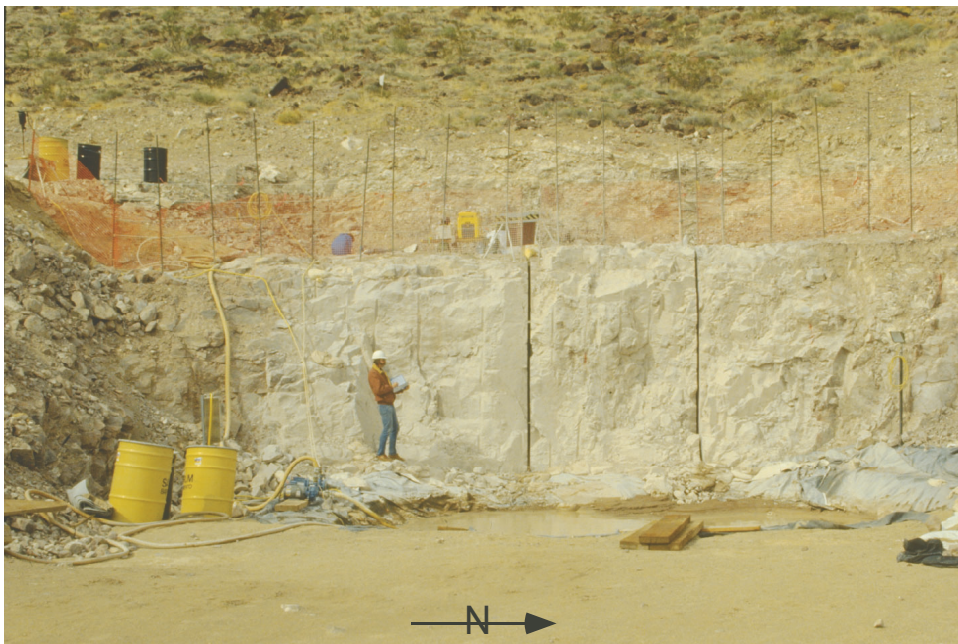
bench face: Site preparations prior to excavation of the LLNL Large Block included benching the side of Fran Ridge to provide access. Looking from the east, the bench face shows two vertical saw cuts created to isolate the Large Block from the surrounding country rock (see [figures 2.6 - work area](#), and [2.7 - belt saw](#)). Cutting fluid (water) was drained away from the bench to the sump seen in the foreground. Barrels in the upper left-hand corner of the image were used to supply fluid for our ponded infiltration test (see [figure 3.3 - initiation of flow](#)). M. Mann (SNL) is in front of the bench face (white helmet), directly above him, on the level work area, an individual dressed in blue is preparing for the ponded infiltration test.
